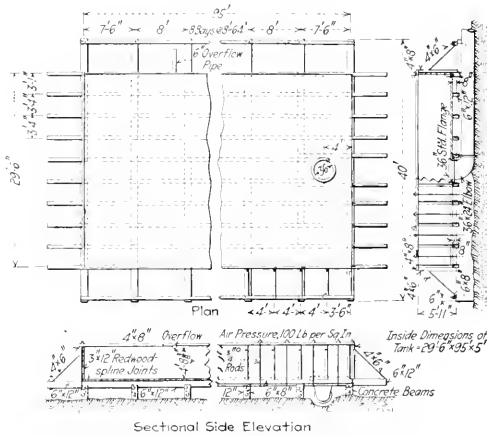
DETAILS OF CONSTRUCTION OF WOODEN WATER-STORAGE TANK
